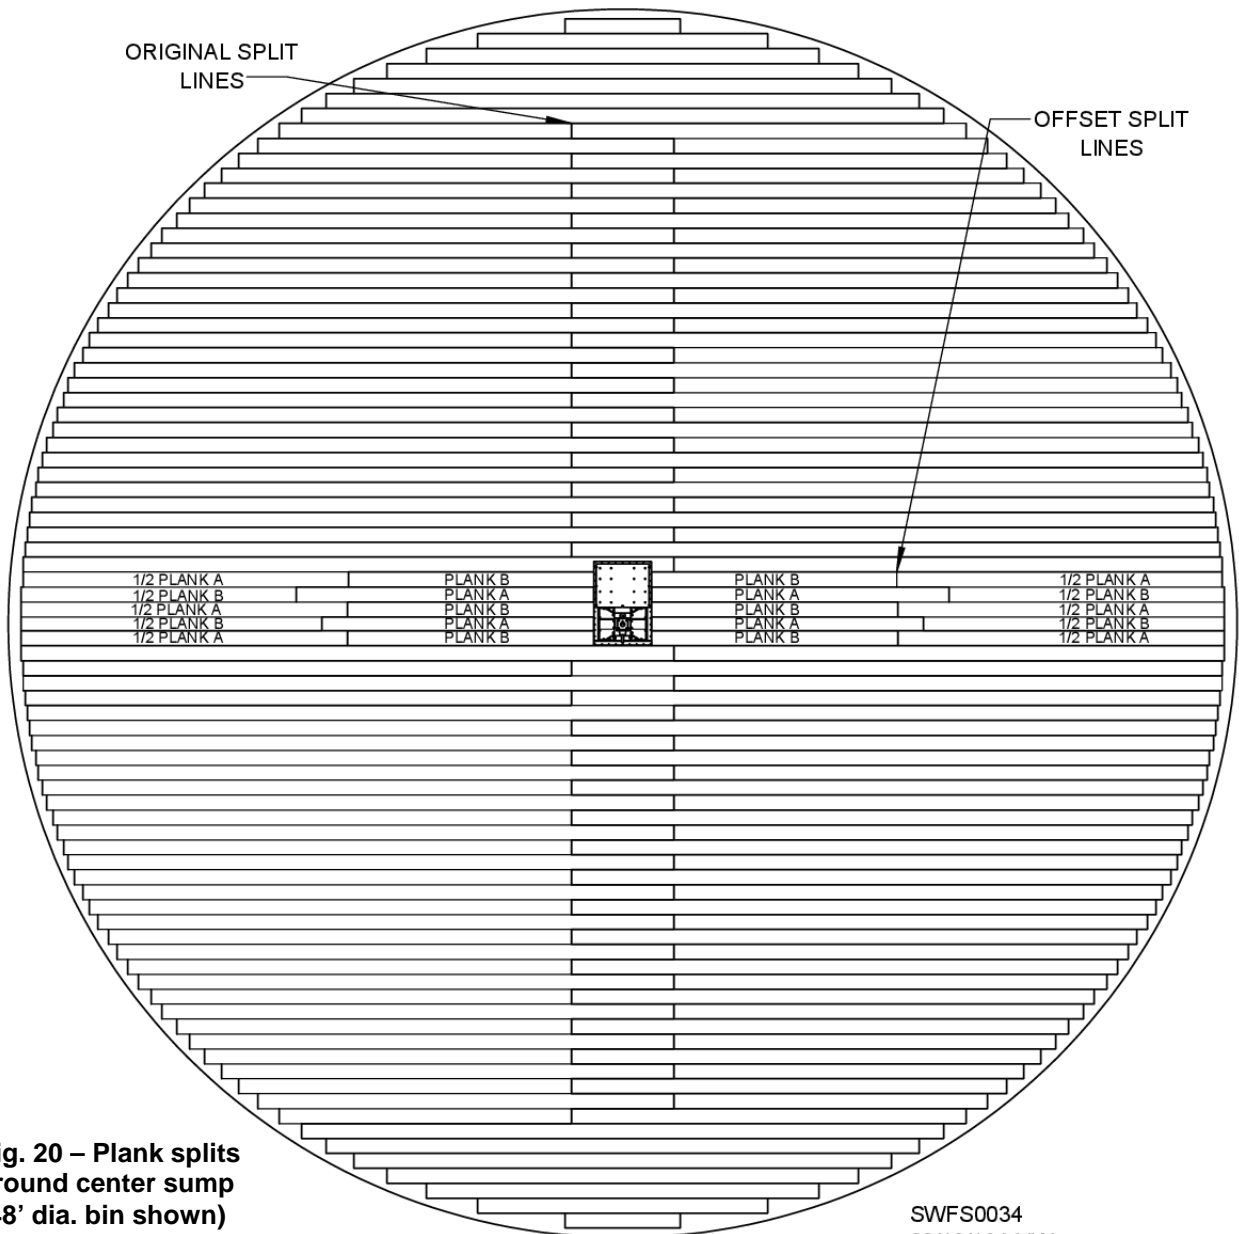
Plank splits around center sump (48' dia. bin shown)
